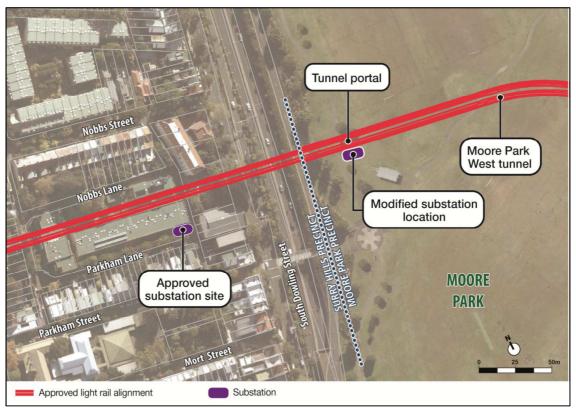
Location of approved substation and proposed modified location of Surry Hills substation
